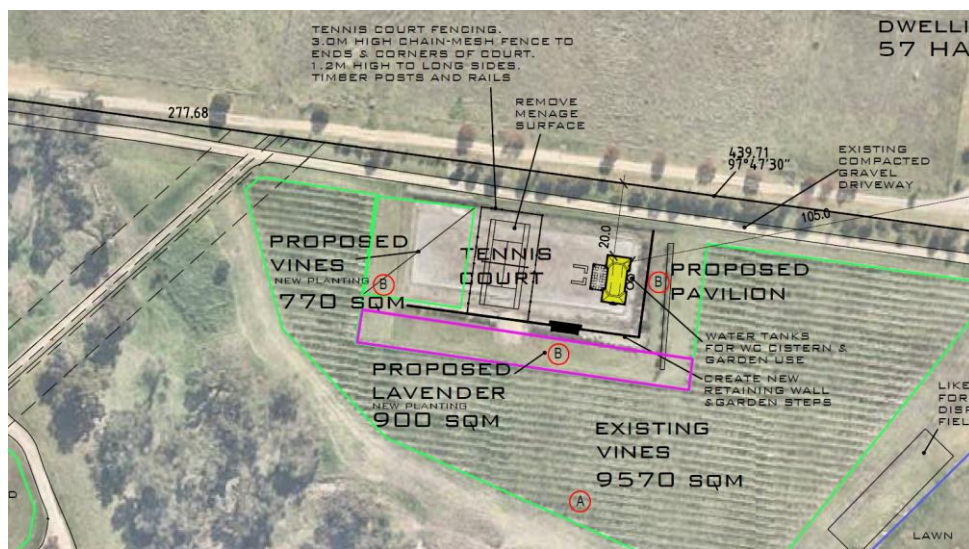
Layout of proposed tennis court and pavilion (source: Development Plans 2024)
